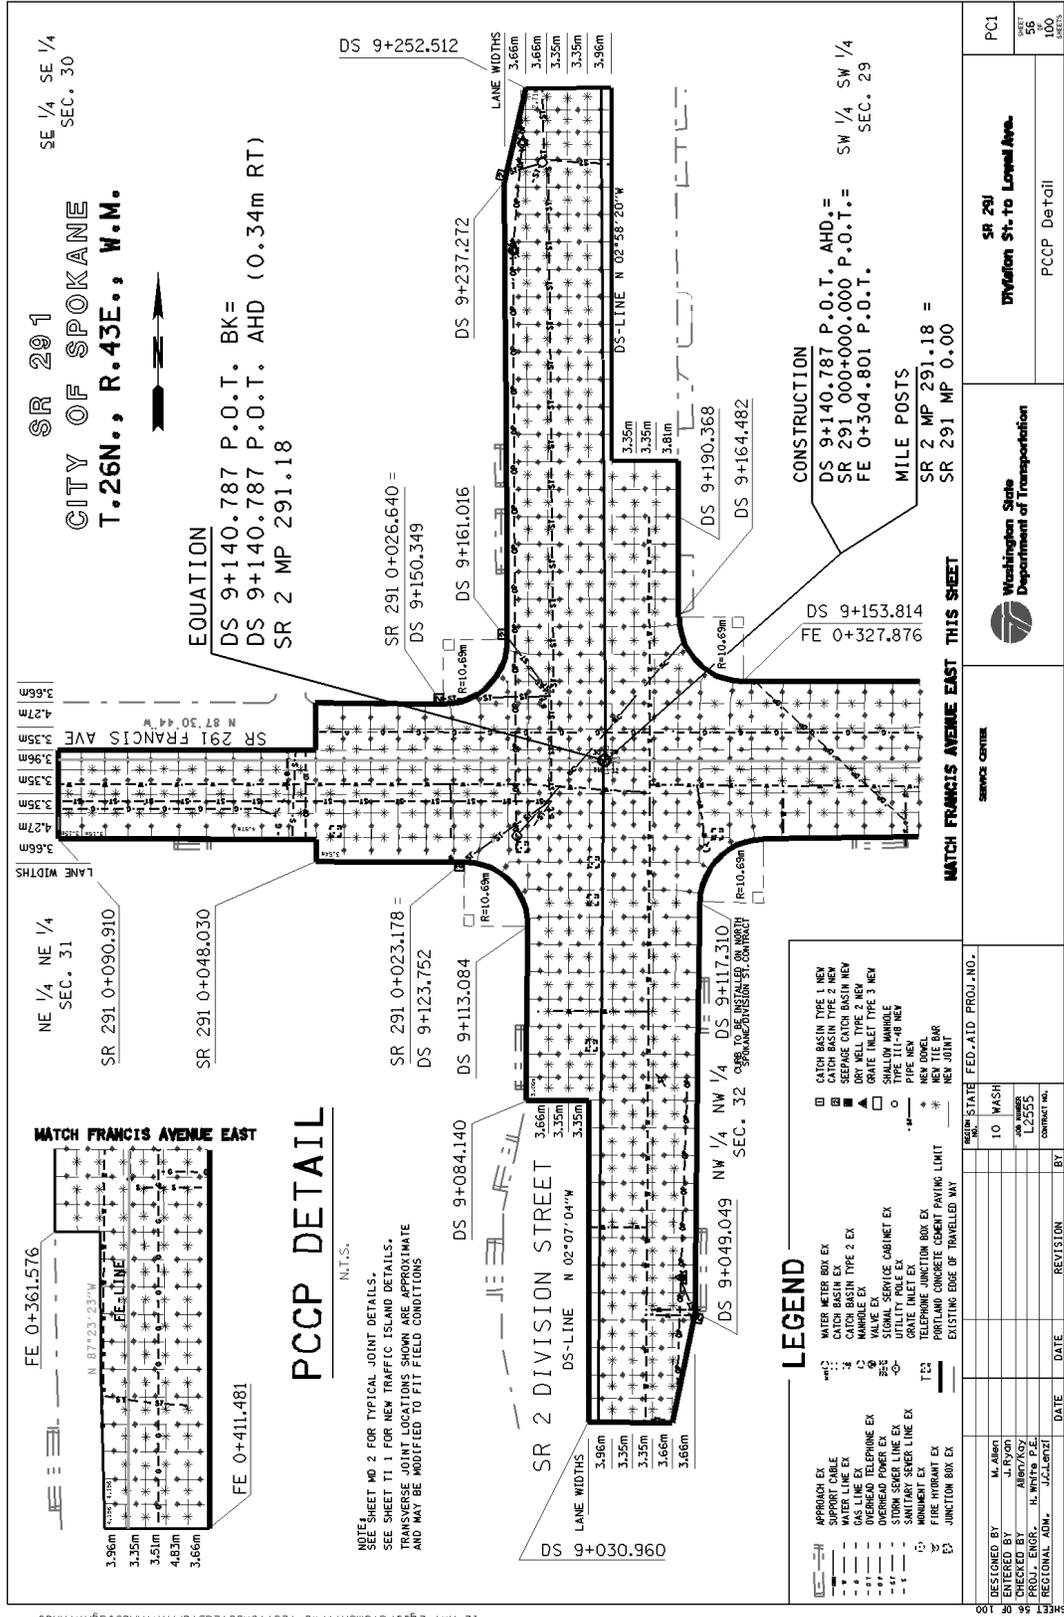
SR 291, Division Street and Francis Avenue - revised jointing plan.
